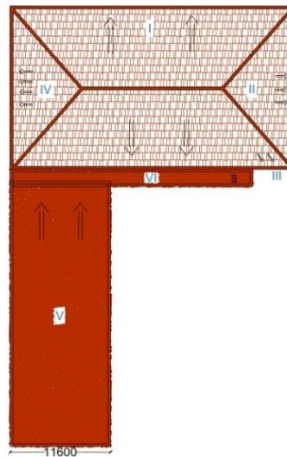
The Segmentation of Roof Section of Khonsa Dormitory Building
